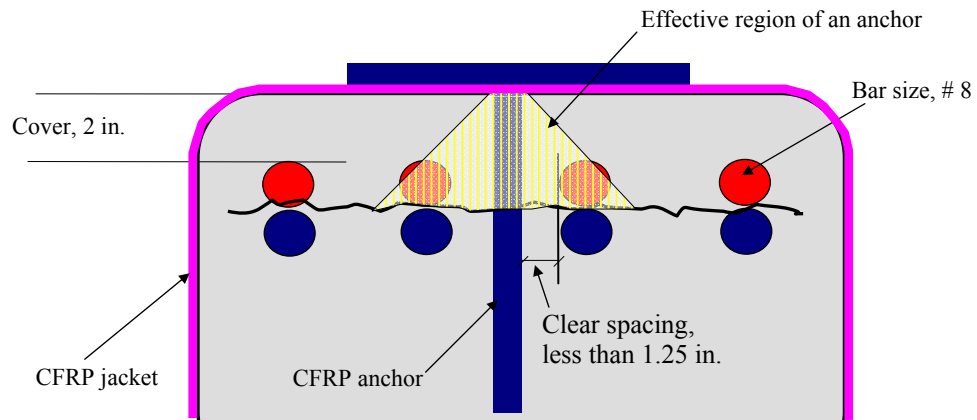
Spacing between CFRP anchor and lap spliced bars
